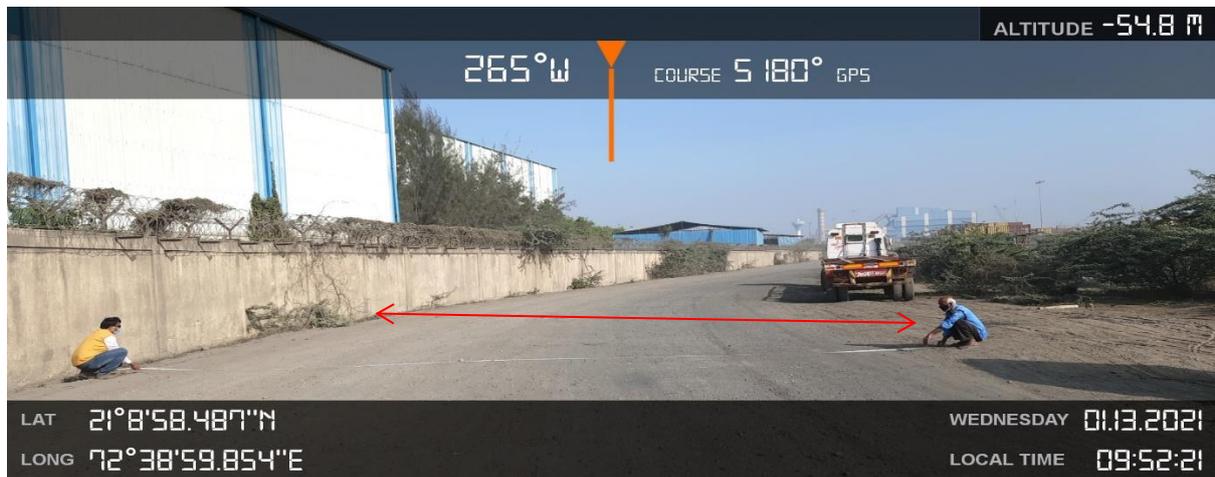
Width Measurement at Approach Road nar Proposed Unit
